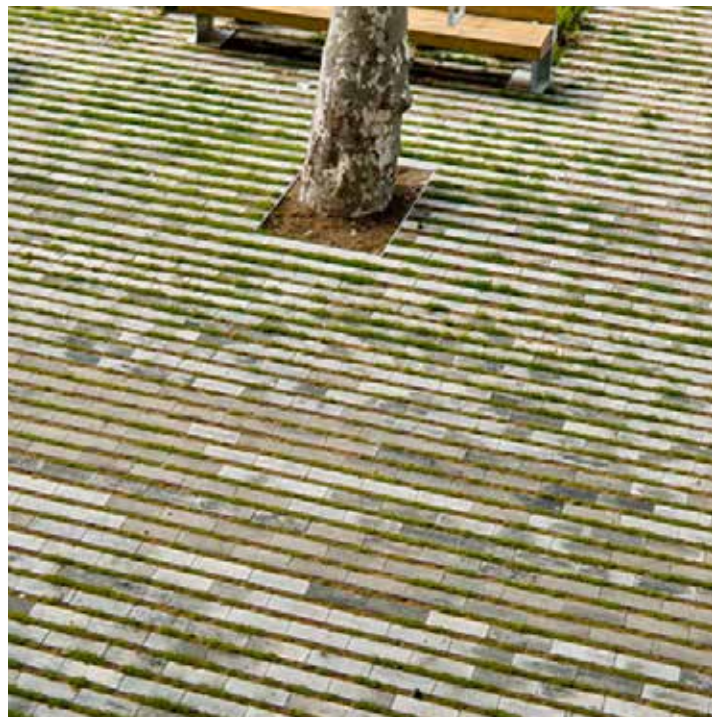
Streetscapes with landscaping, planting, hardscape areas, sidewalk details and street furniture can integrate Large-Format retail into Napa Pipe and the surroundings. Landscaping, as well as permeable paving, contribute to stormwater management.
